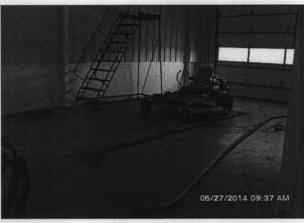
Wash bay located within maintenance facility. Floor drains are directed to the headworks of the wastewater treatment plant.
